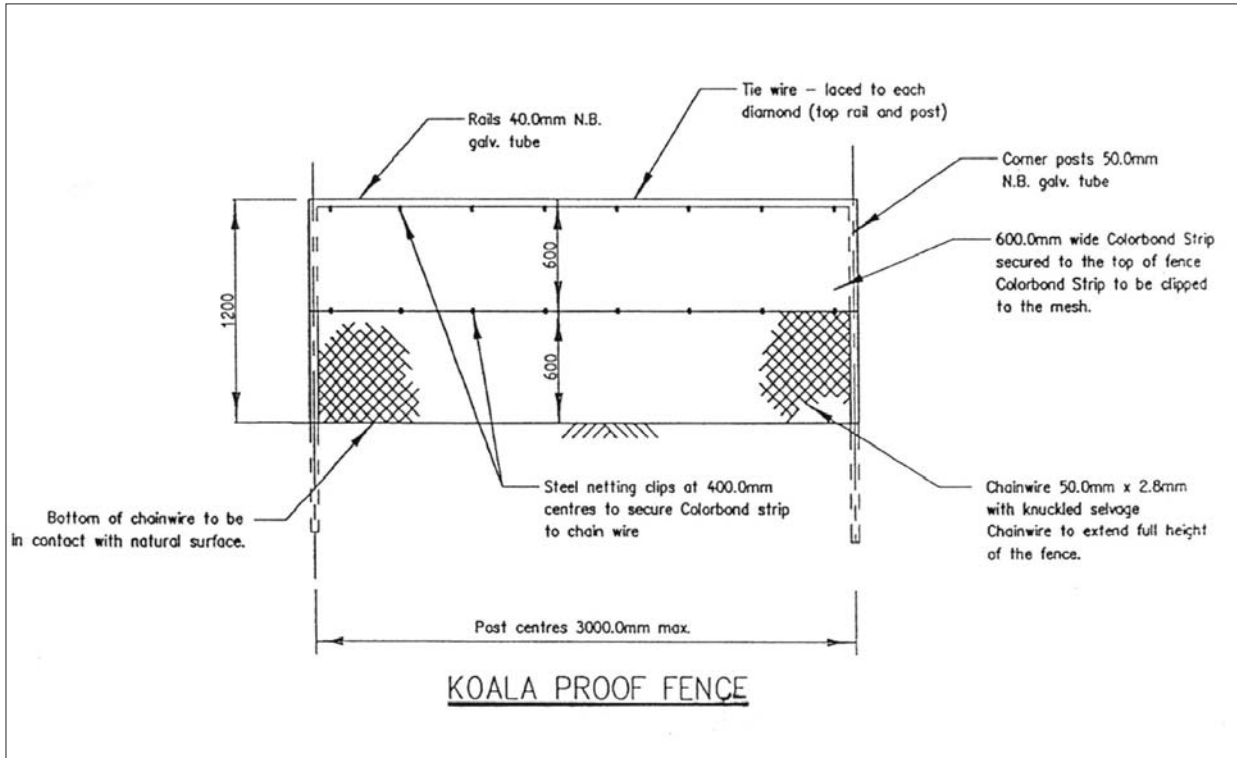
Design drawing for a 'sheet metal' type Koala-proof fence
